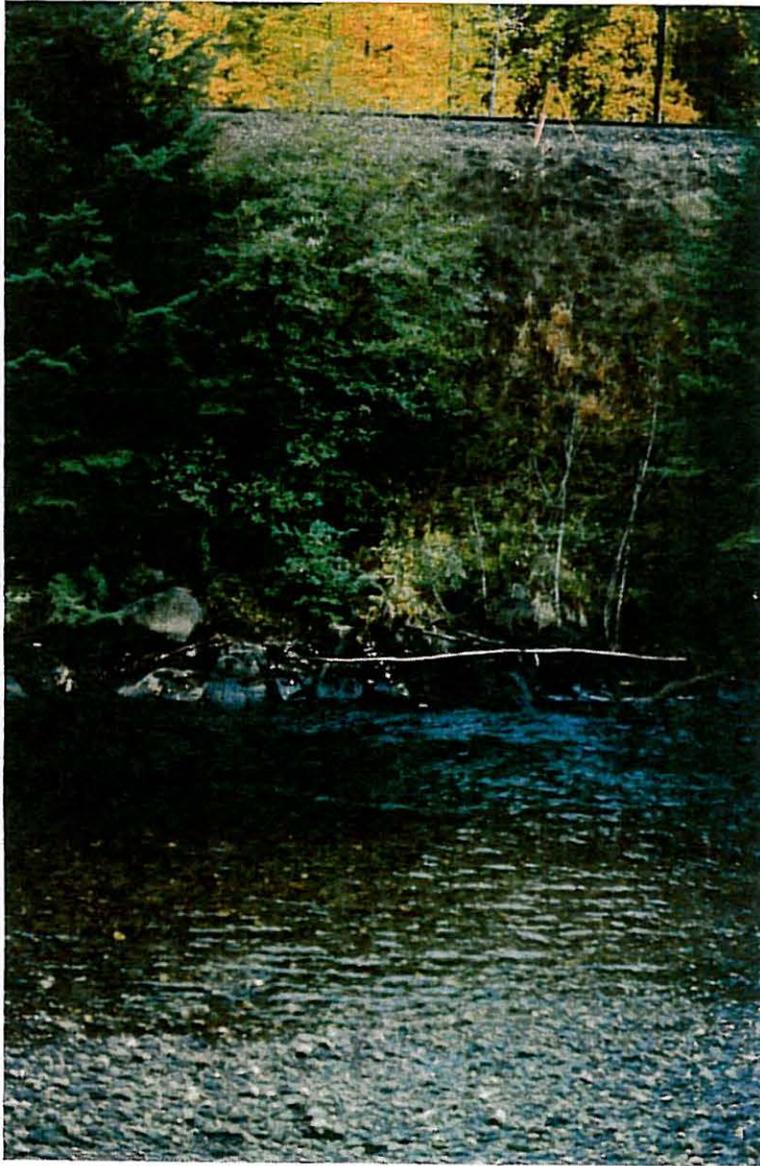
Cabin Creek. Right abutment of pipe bridge river crossing. (Transit on proposed centerline)
